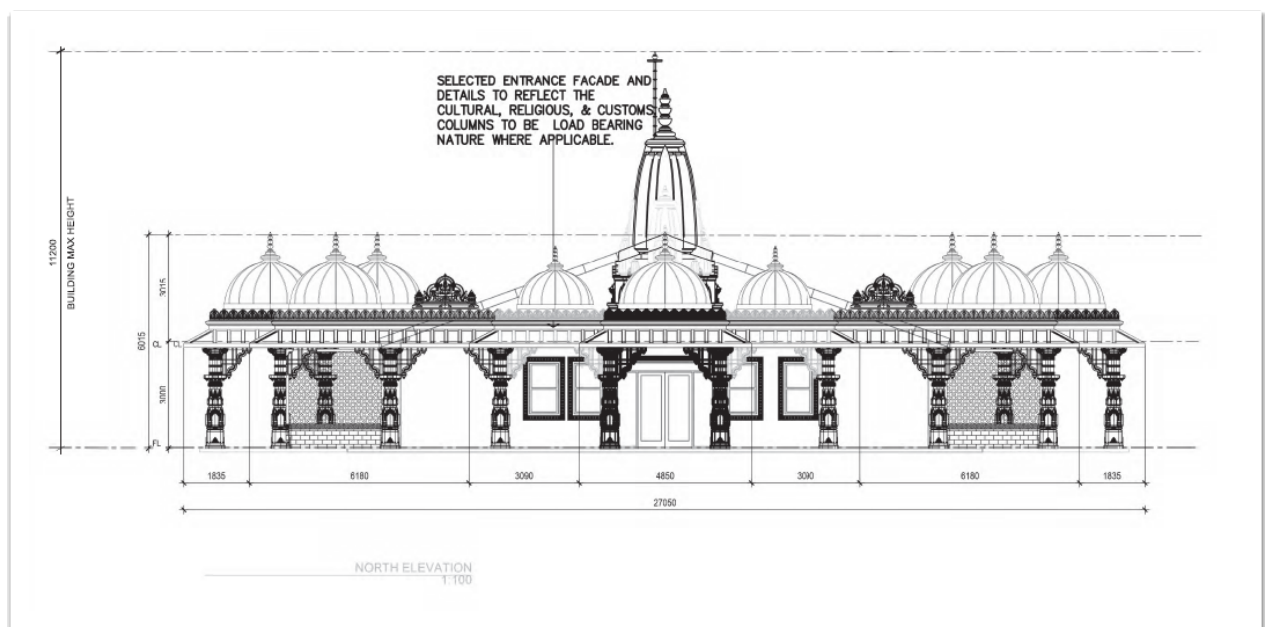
Proposed east elevation (incorrectly labelled on plans) - building main entry. Source: Application plans submitted 13/09/2021
